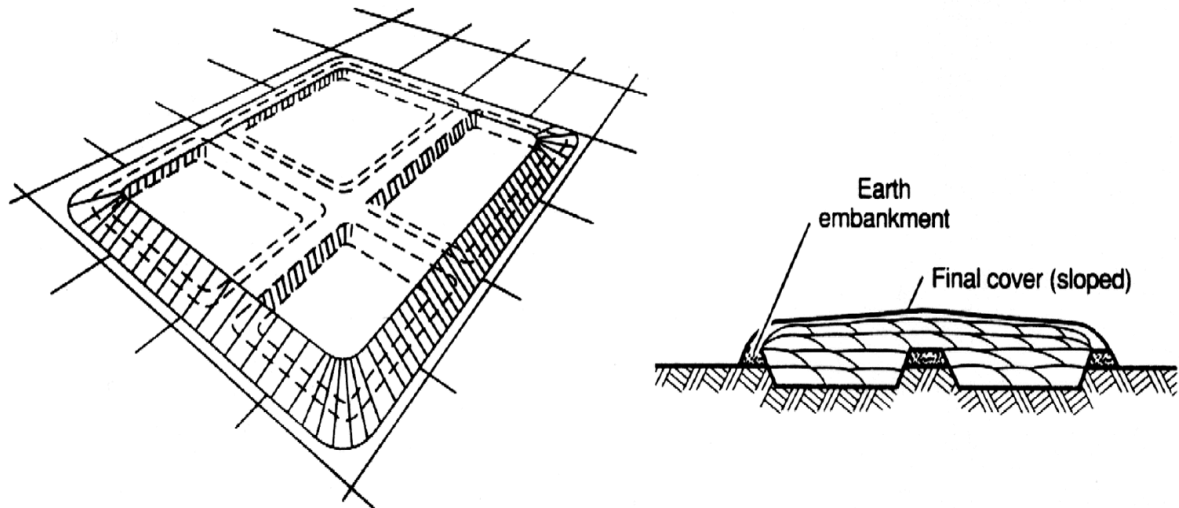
Plan and cross-section of Excavated cell or Trench method, Tchobanaglou et al., (1993)
